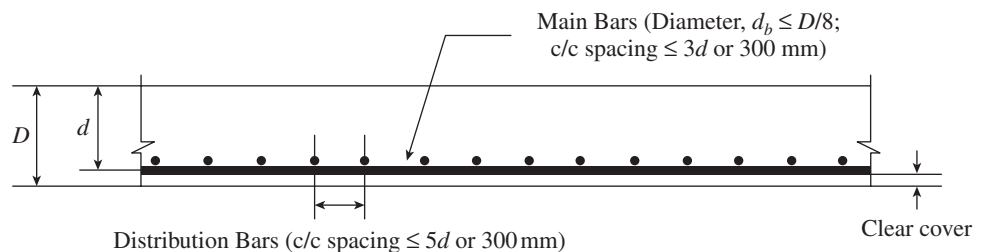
Spacing of reinforcement in one-way slabs for crack control
